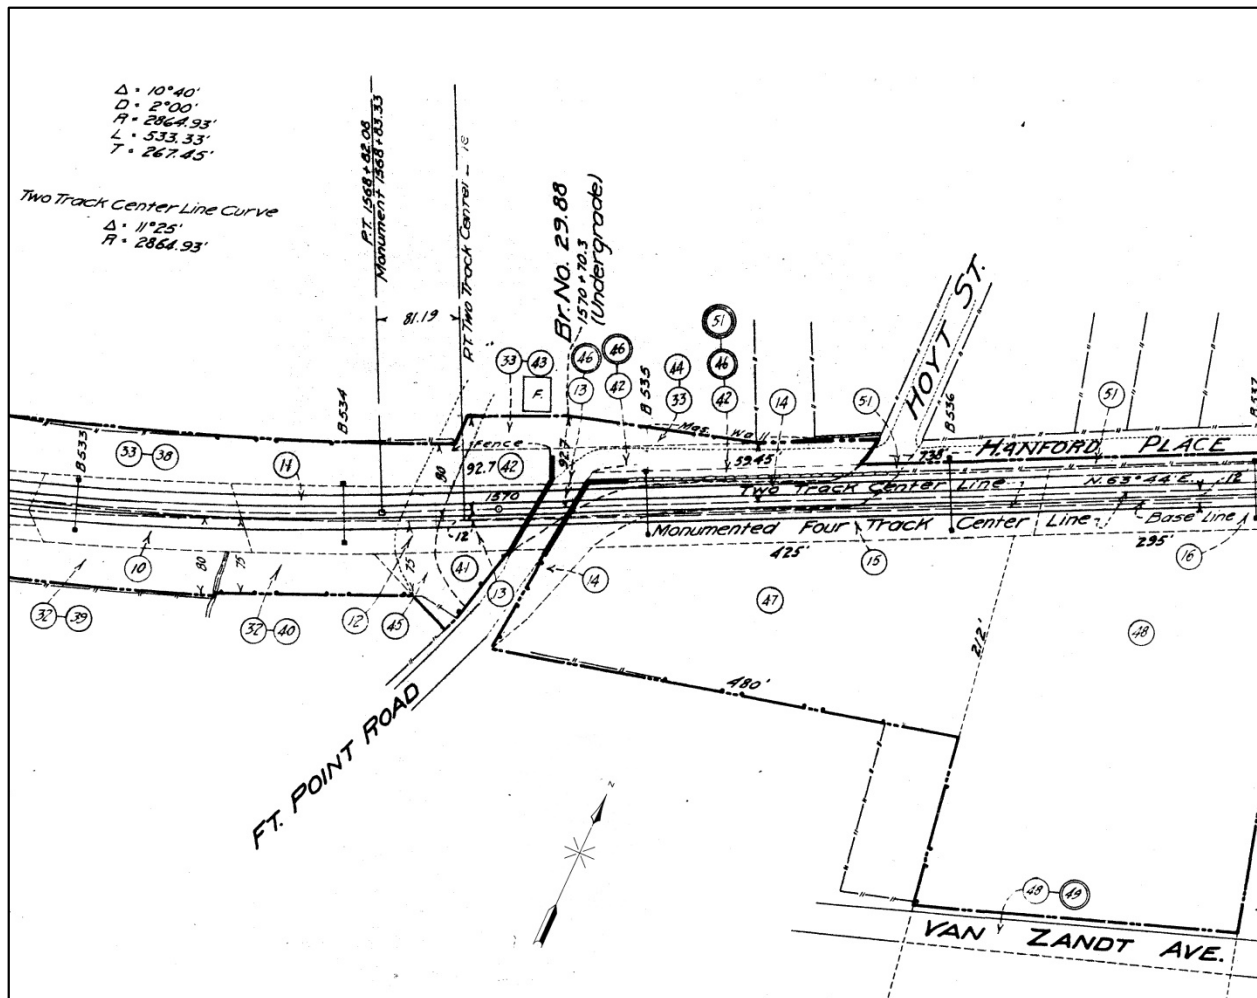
Excerpt from the 1915 railroad valuation map showing the area around the Fort Point Street bridge, designated Bridge No 29.88 at the time. The original alignment of Fort Point Street, indicated by a light dashed line, crossed the railroad right-of-way at even more of an angle prior to the 1890s rebuilding as four tracks.
